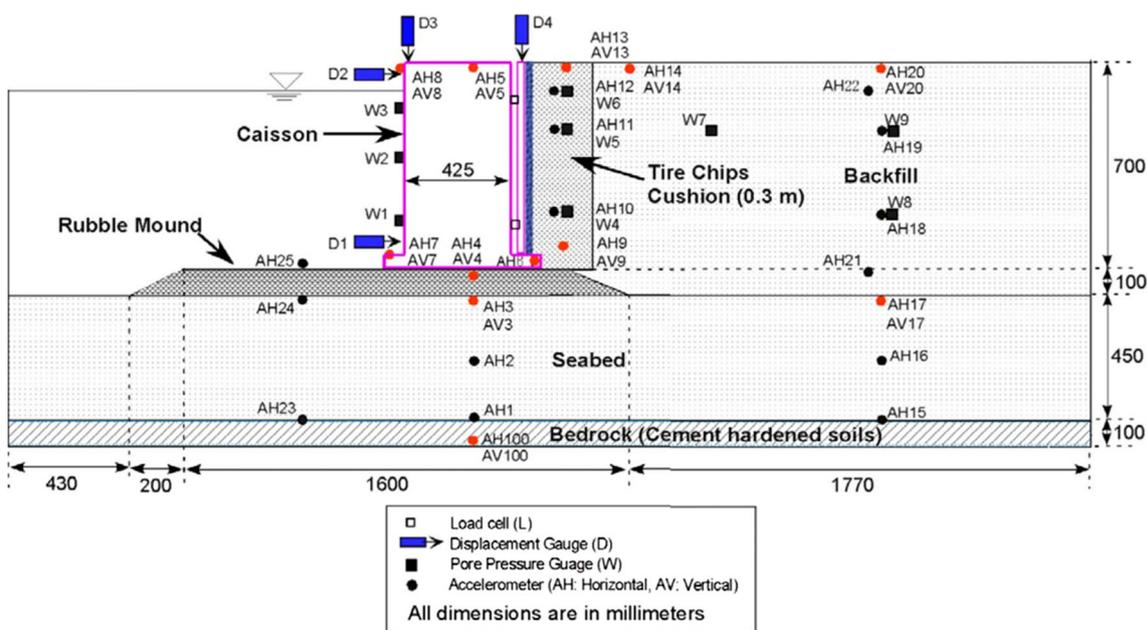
Cross section of test caisson model (after Hazarika et al. [32])
